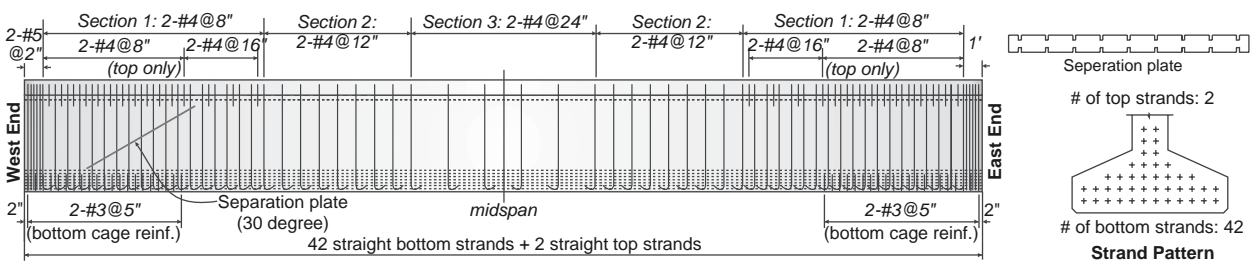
Summary of reinforcing layout in bulb-tee girders.
